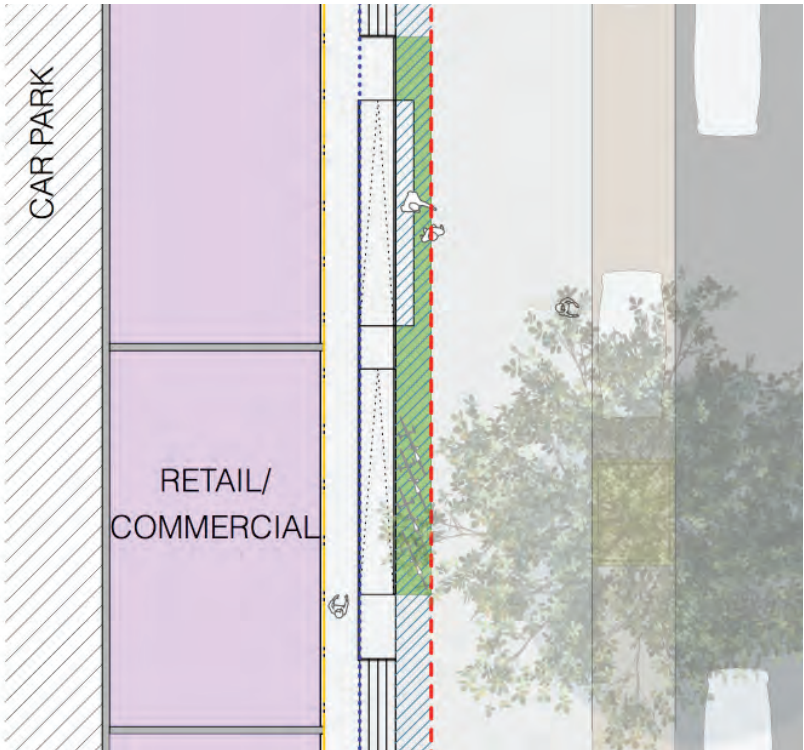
conceptual plan and section of non-residential street interface type B
